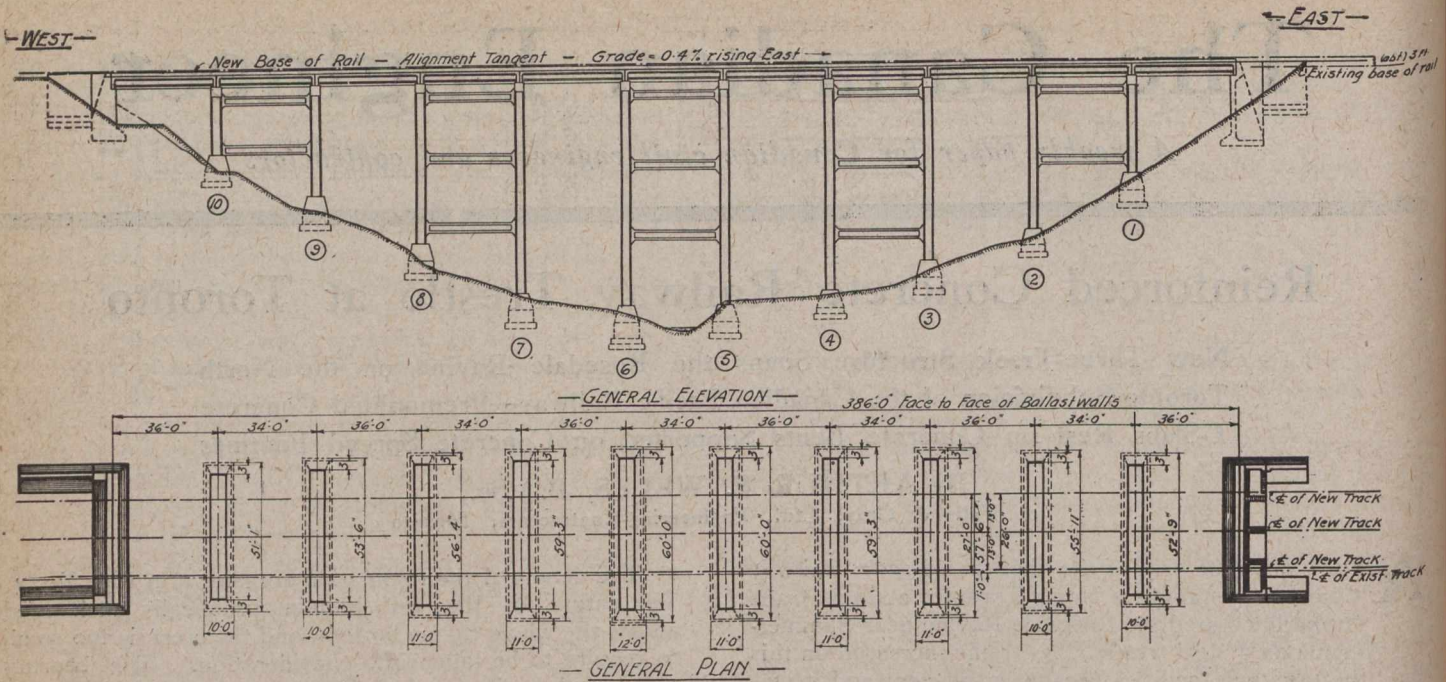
General Plan and Elevation, C.P.R. Concrete Trestle
